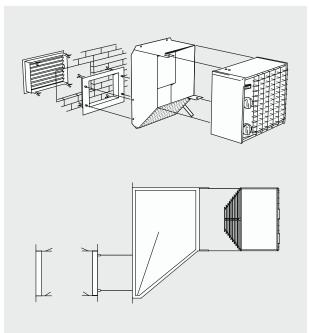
Cutaway view and side view of Cat with mixing cabinet.
